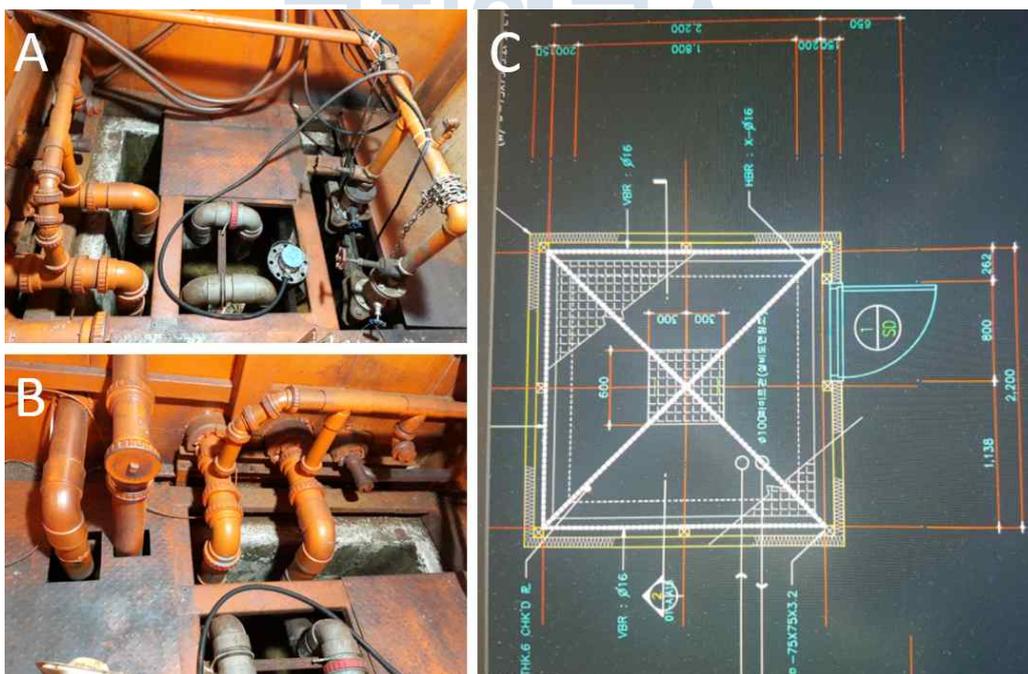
The structure (A, B) and drawing © of the sewage collection facility for the main building at King Sejong Station.
